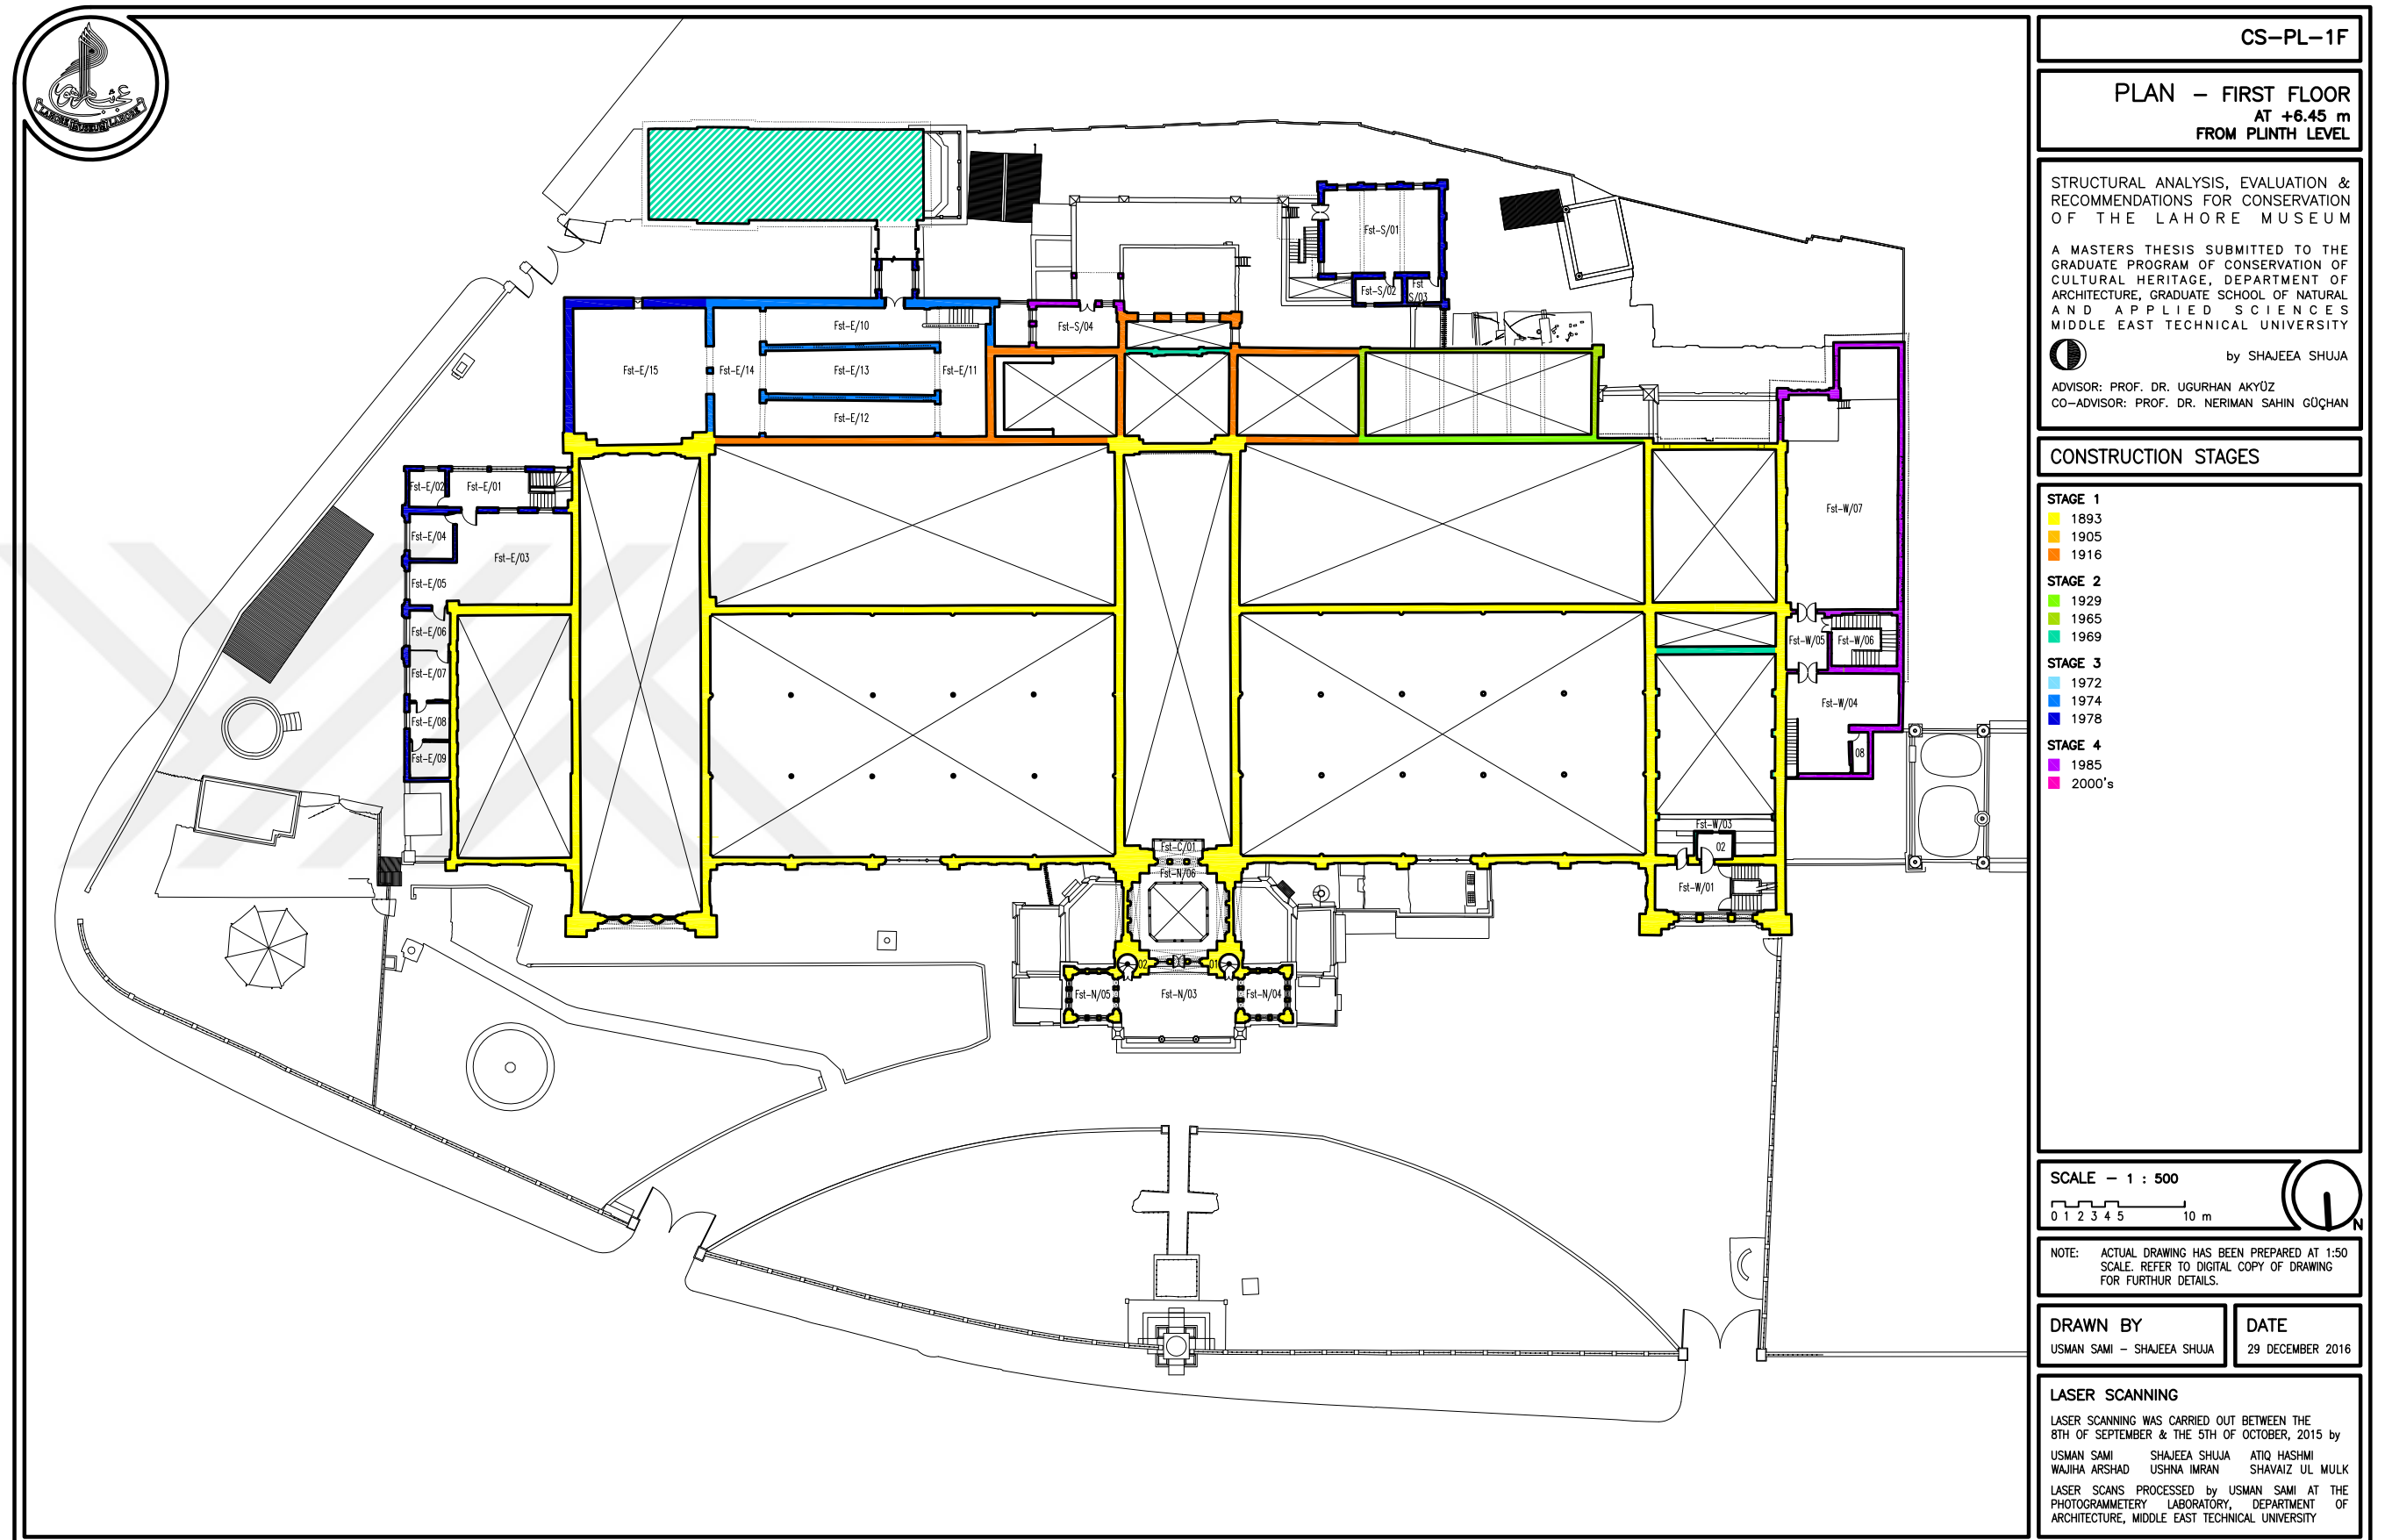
CS-PL-1F – Construction Stages – Plan – First Floor (2017)
